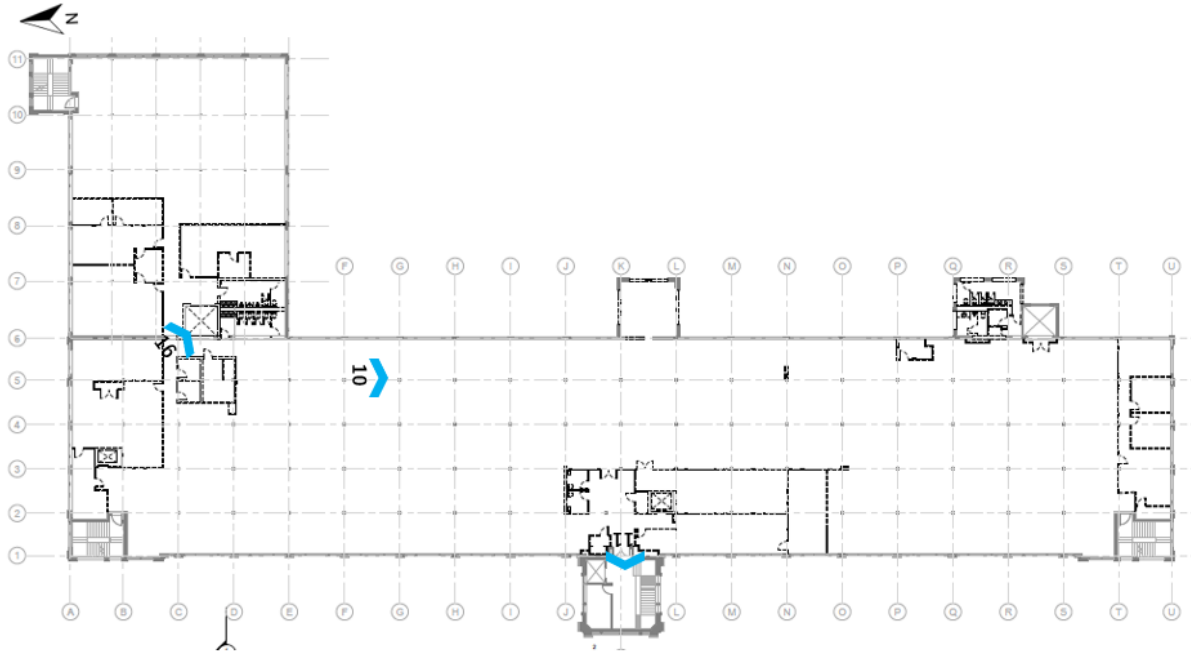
Photo Key Plan – Main Office/Factory Building – First Floor
